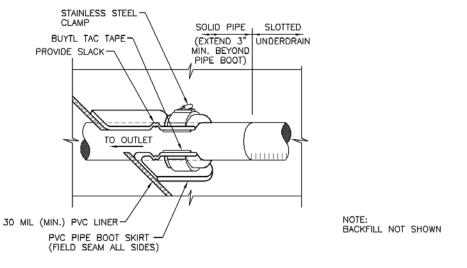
Geomembrane Liner/Underdrain Penetration Detail
